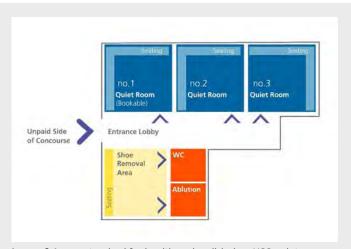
A new standard for health and well-being: HS2 quiet spaces technical specification': Indicative layout plan for a staff quiet room facility
